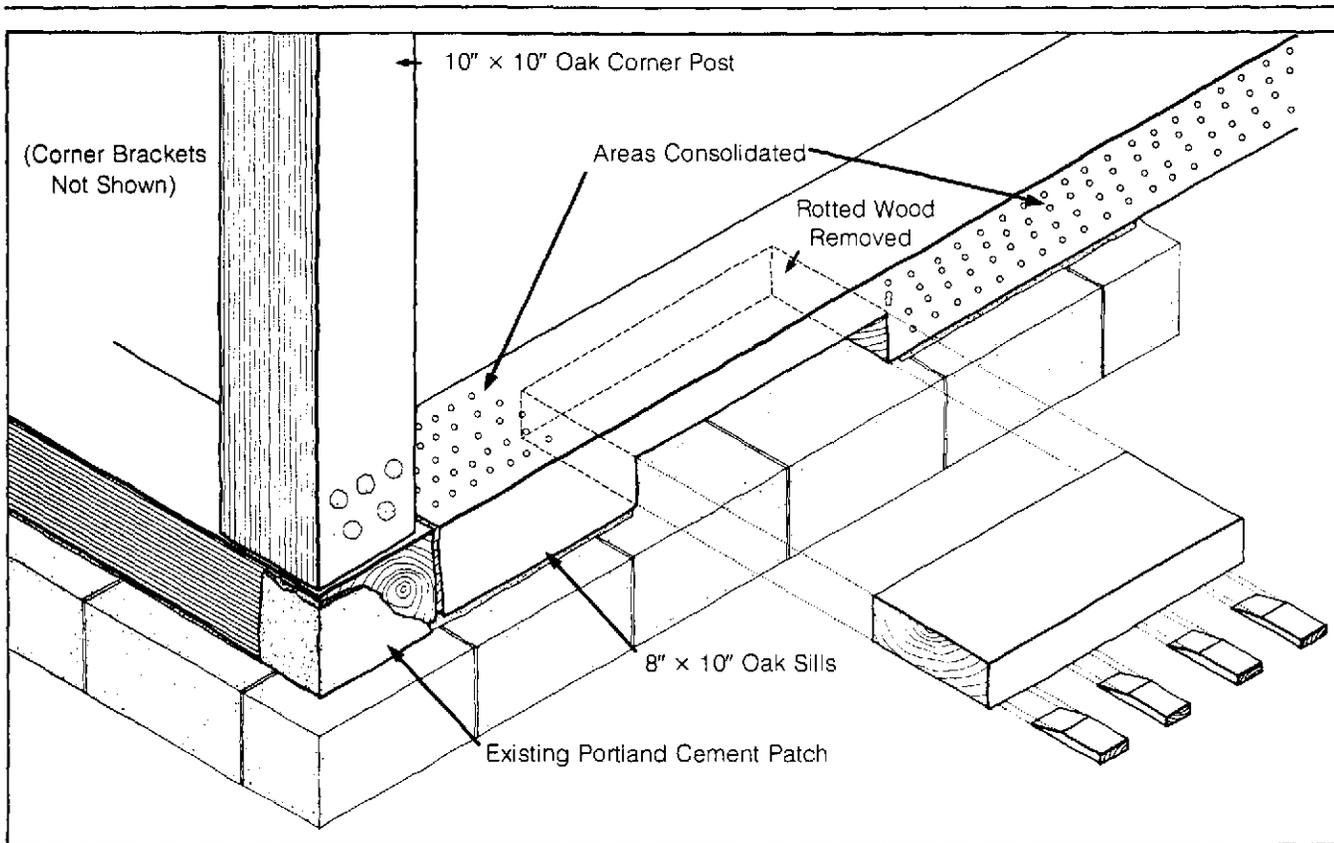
Longfellow House, Corner Post and Sill SE corner, framing isometric indicating decayed areas and areas drilled for consolidation.
